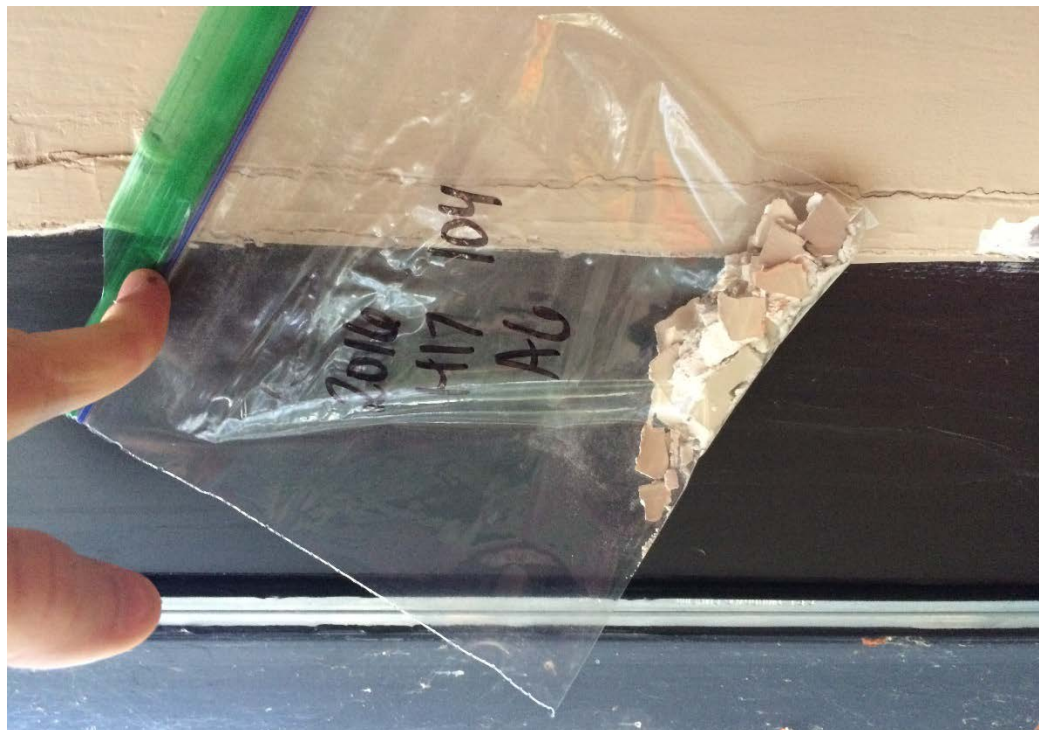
Asbestos sample A6, drywall joint compound collected from wall of H17-104. No asbestos detected.
